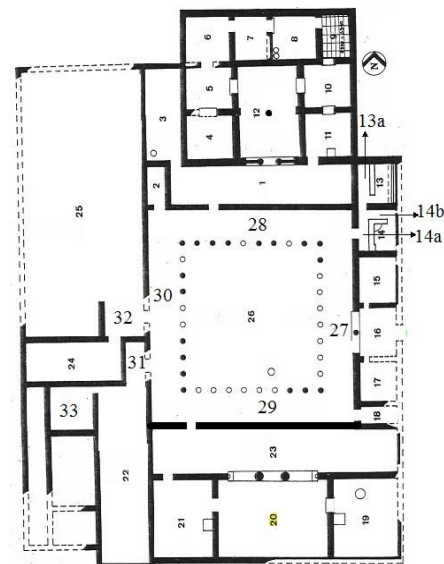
Plan of Jebel Khalid Palace with new spaces added
